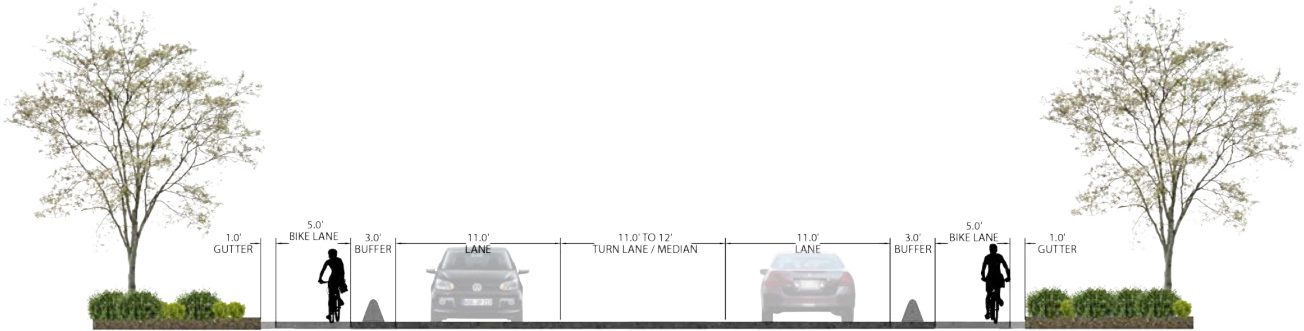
East Jordan Canal Trail typical sections of protected bike lanes on South Union Ave from 1020 E to Union Park Ave.
